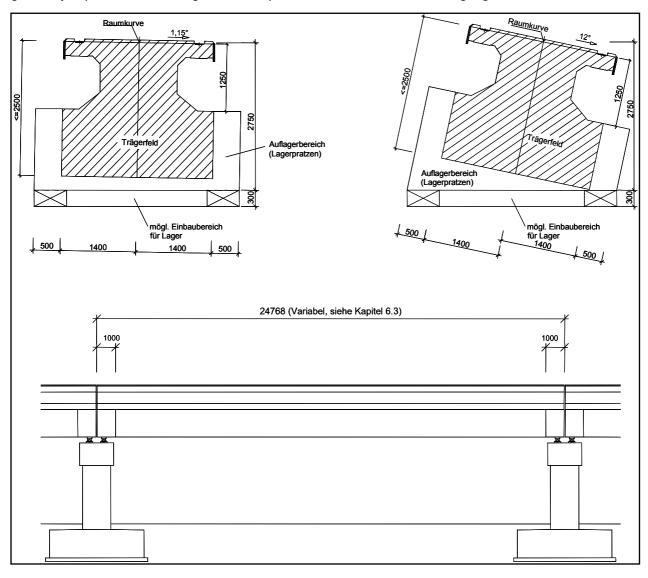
Maximum sectional dimension for standard guideway type I (example)
